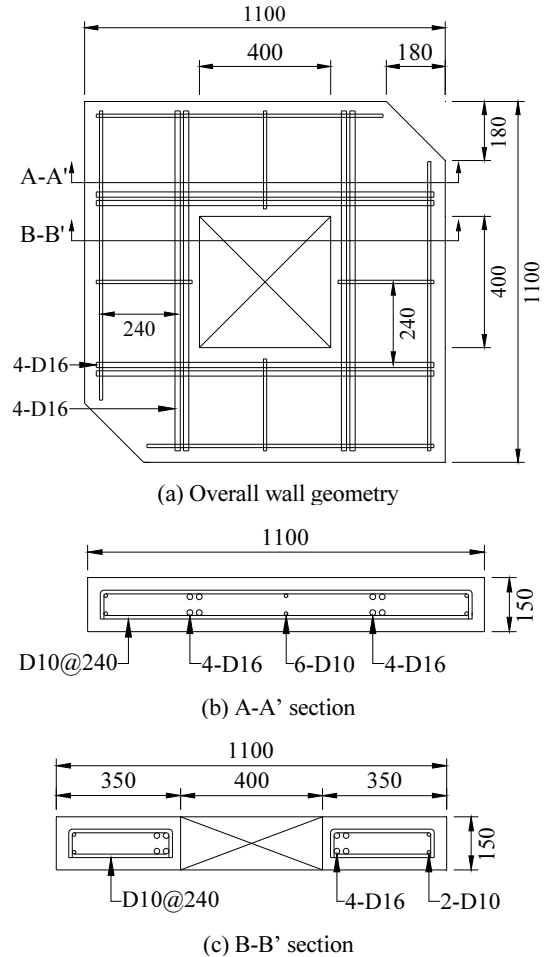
Section dimensions and reinforcement arrangement of specimens (all dimensions are in mm)
